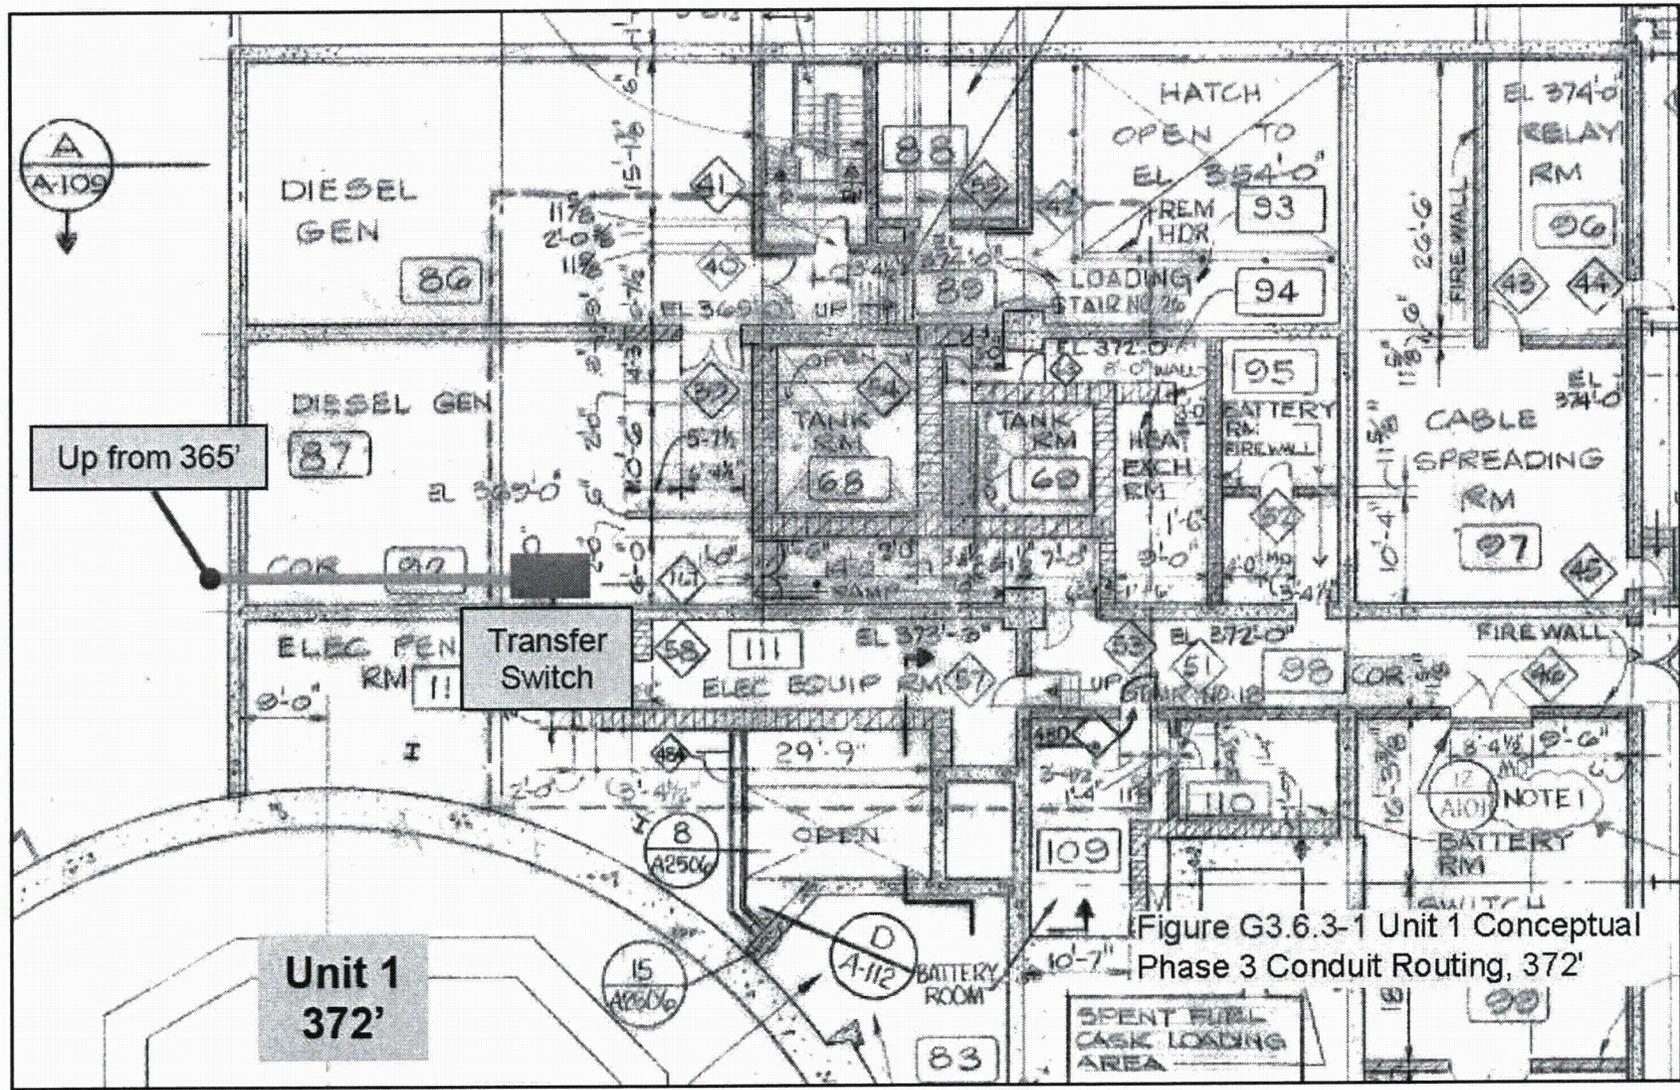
Unit 1 Conceptual Phase 3 Conduit Routing, 372'
